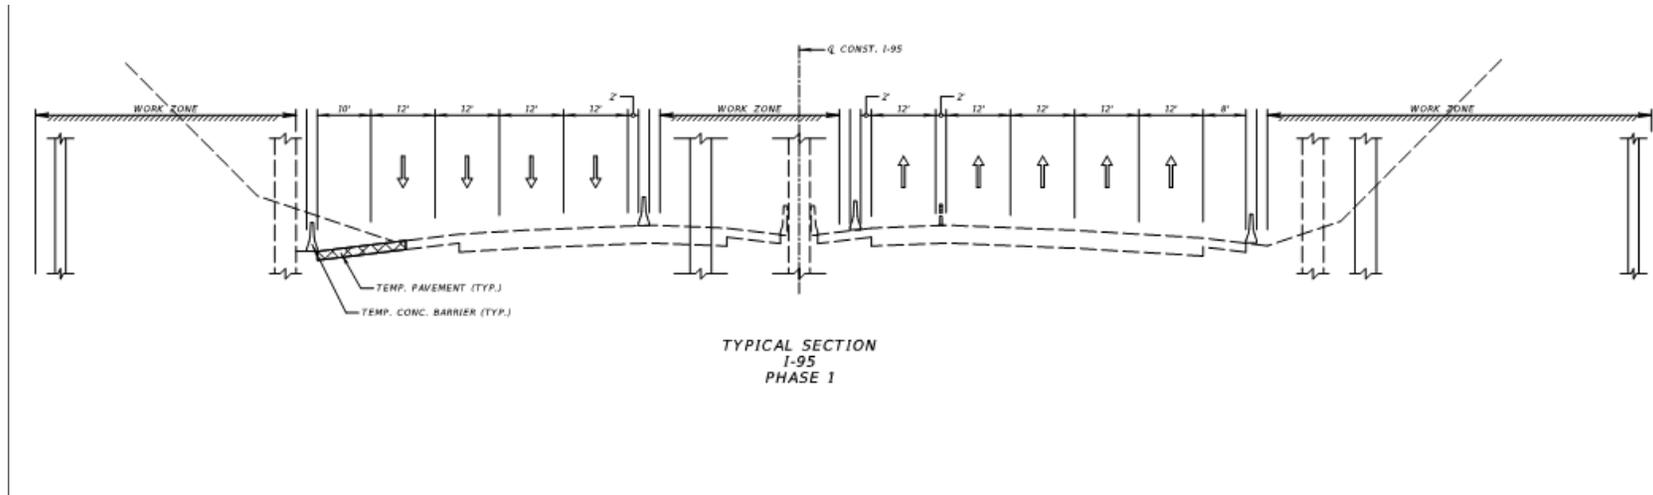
TCP Typical Section I-95 – PHASE 1
